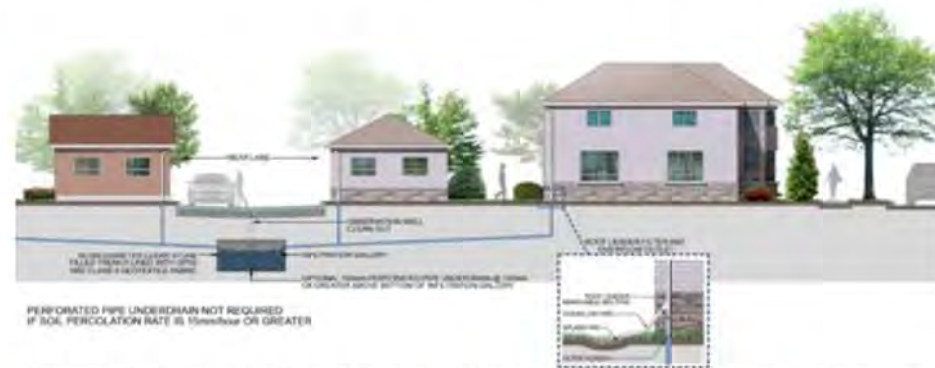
Cross Section of an Infiltration Trench System below a Laneway
